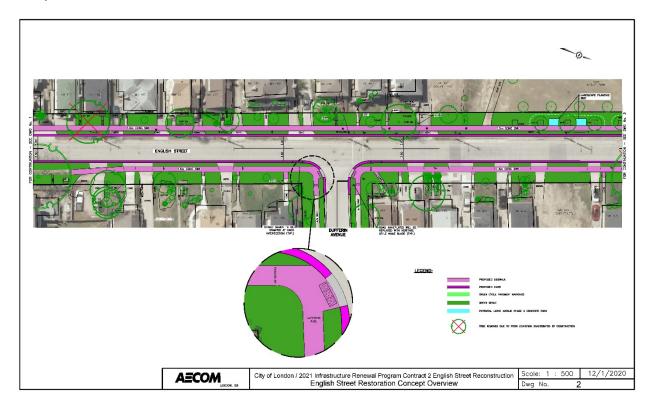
English Street Infrastructure Renewal Project design drawings for English Street between Queens Avenue and Dufferin Avenue. Note: specifications for street name stamping at corners and Heritage Conservation District street signs.
